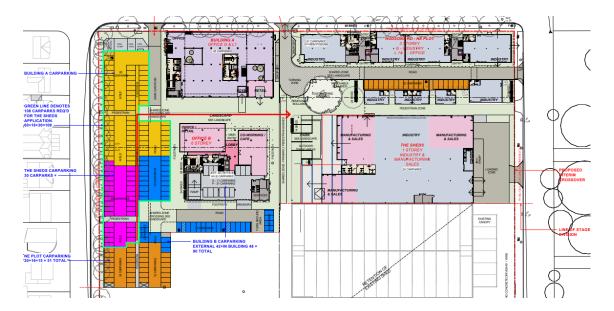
Proposed parking arrangement, Source: Architectural plans (TP400 Rev A) by Six Degrees Pty Ltd
